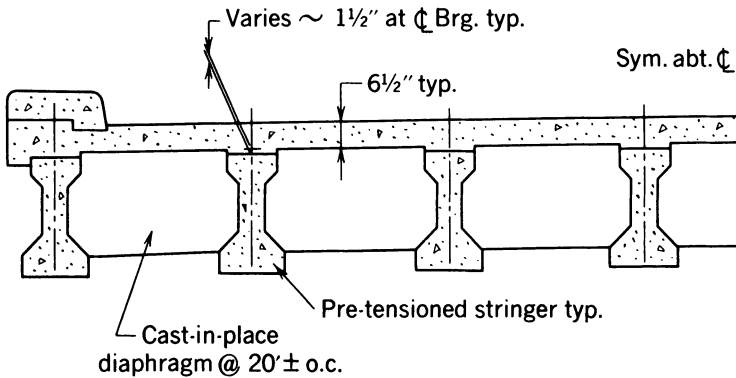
Half-section of a short-span composite-stringer bridge.
